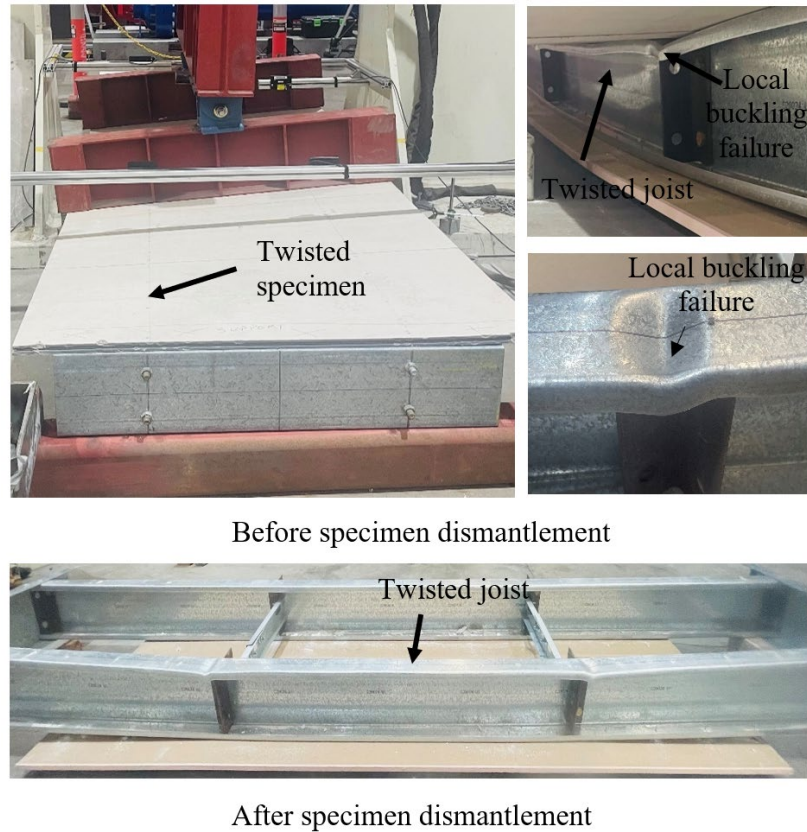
Failure of the channel joists in Specimen FS1
